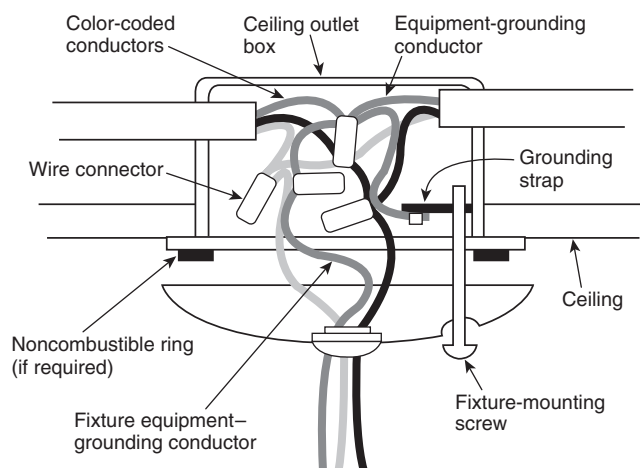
Installation of Chain-Hung Lighting Fixture.
